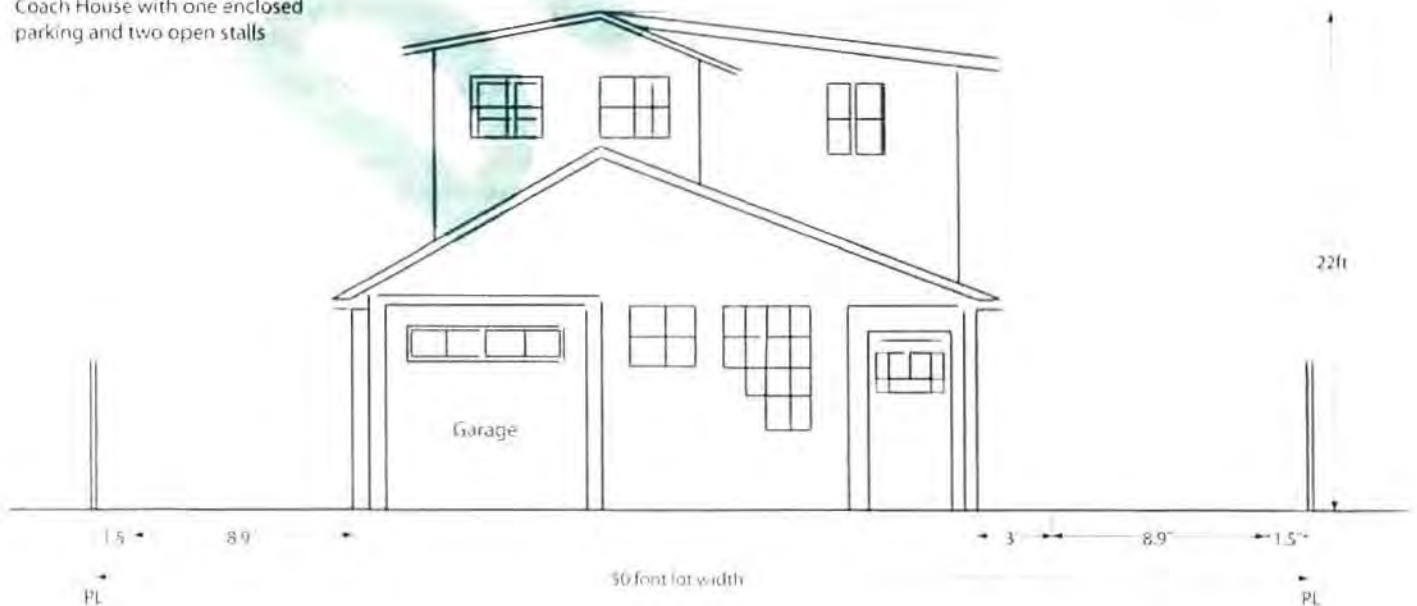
Typical Coach house siting and setbacks ex. 50' x 120' lot with coach house in rear
